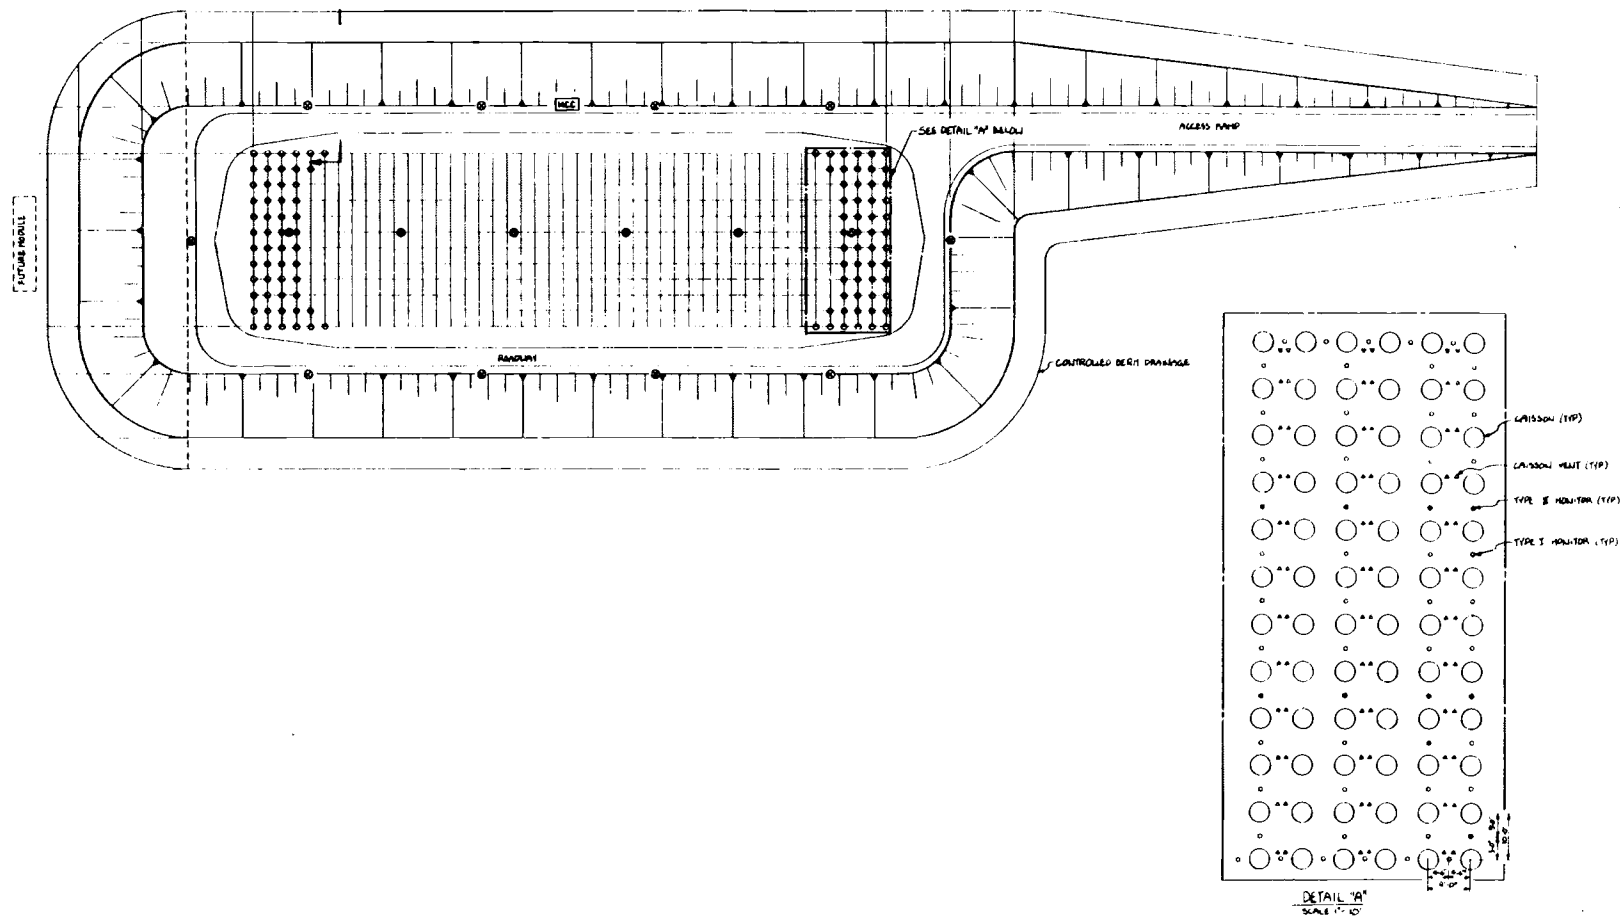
Typical Berm Module for Drywell Storage of RHTRU Wastes
